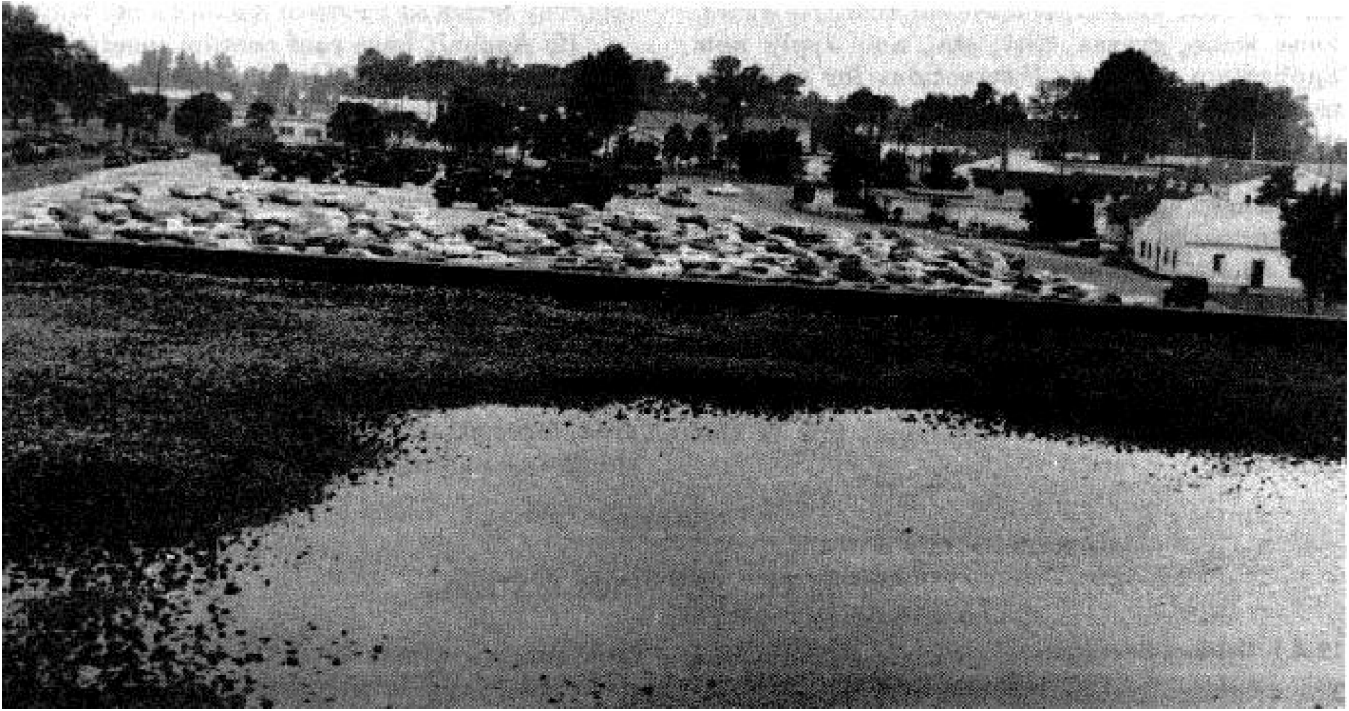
Drain not located in low area — ponding sometimes caused by structural defect.
